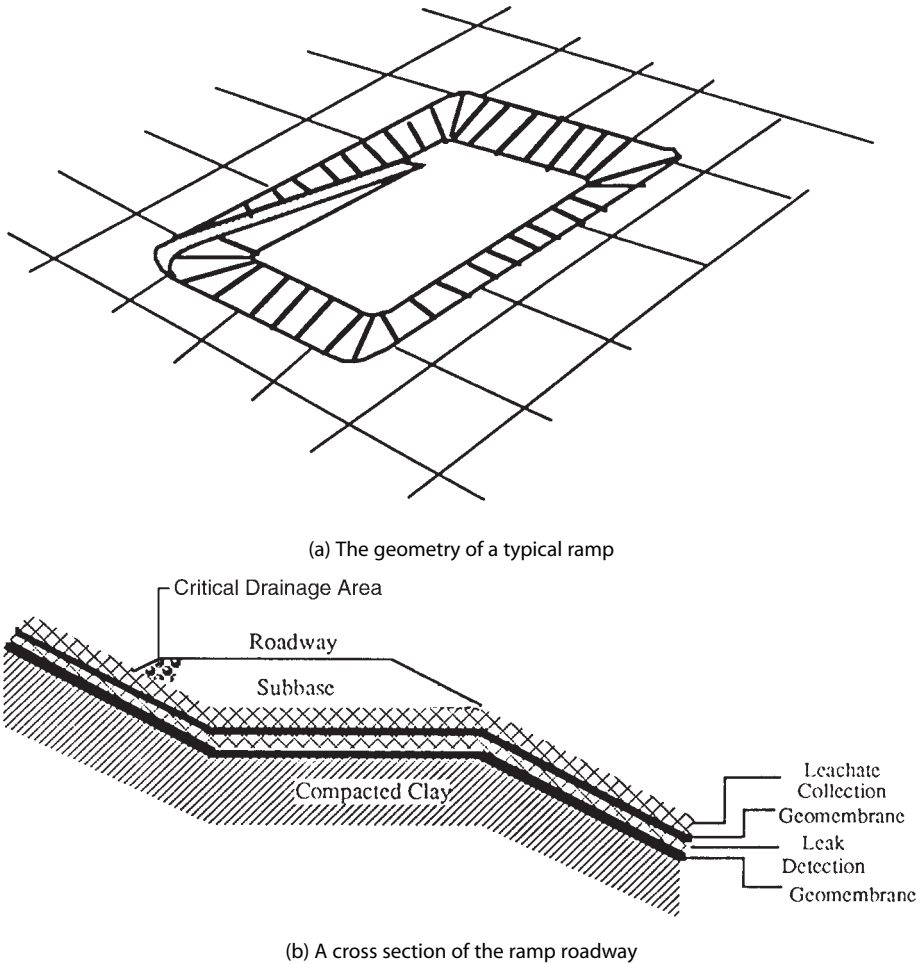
Typical Access Ramp Geometry and Cross Section.
